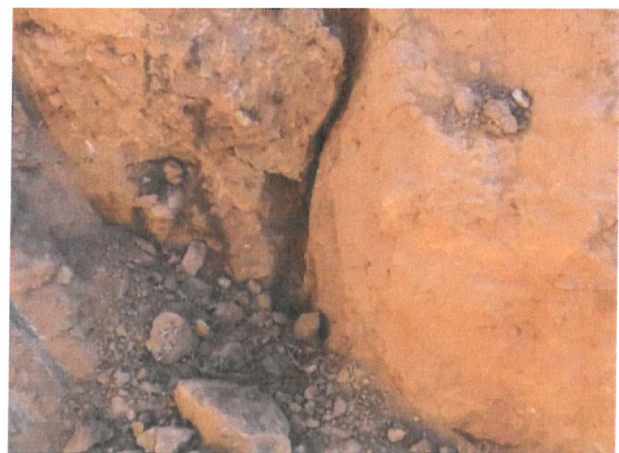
A1-9 – T-3 location: Overlooking H-50 (foreground) and H-49 (background) during exploration. Rocks have been removed to show general openness of the crack at the surface. A shallow dirt bridge still spans the crack between H-49 and H-50.
